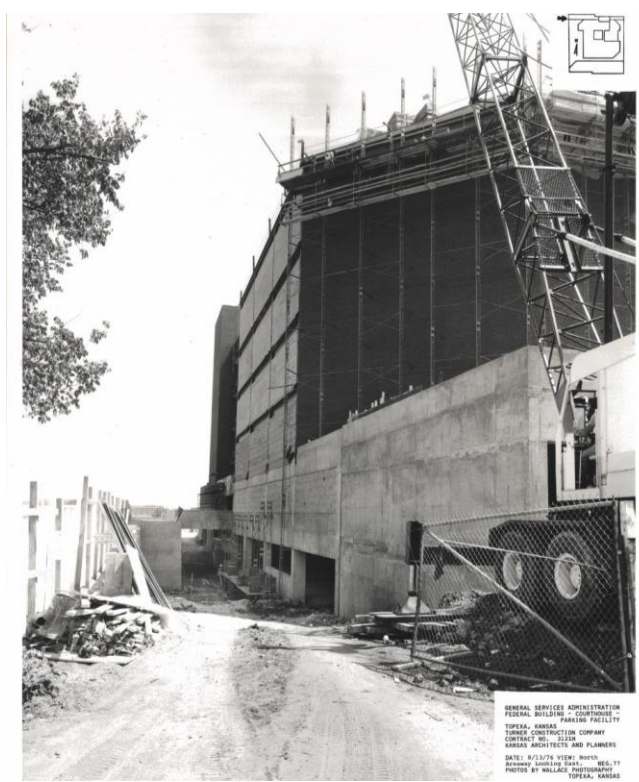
Oblique view of northwest corner showing drive toward loading dock, August 13, 1976, Wallace Photography, on file at Frank Carlson Federal Building and US Courthouse.
